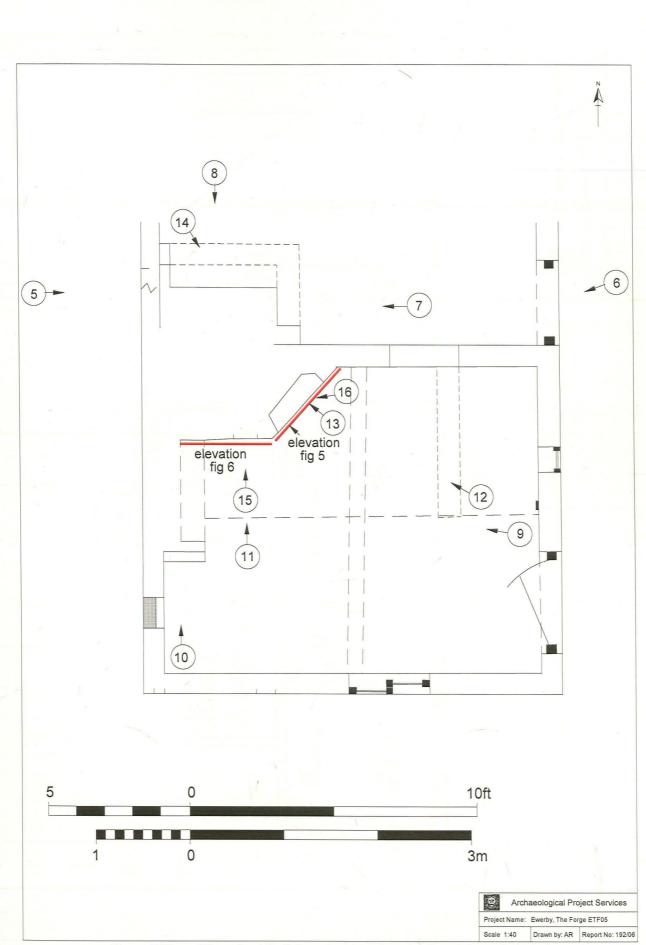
Plan of Examined Building, showing elevation locations and plate views
